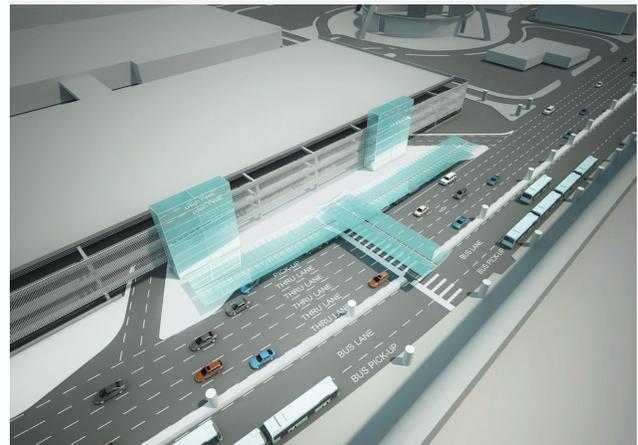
Option 1: new vehicular curbsides with POV pickup at face of parking garage. Rendering shows weather-protection canopies and crosswalk, and vertical transportation elements at garage
